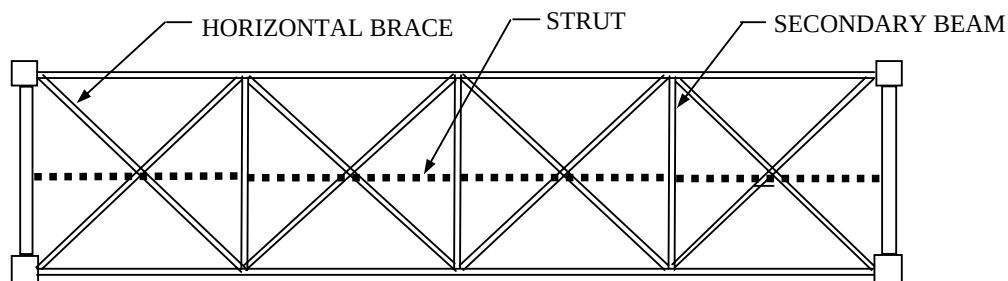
Typical Pattern of Horizontal Brace & Strut
